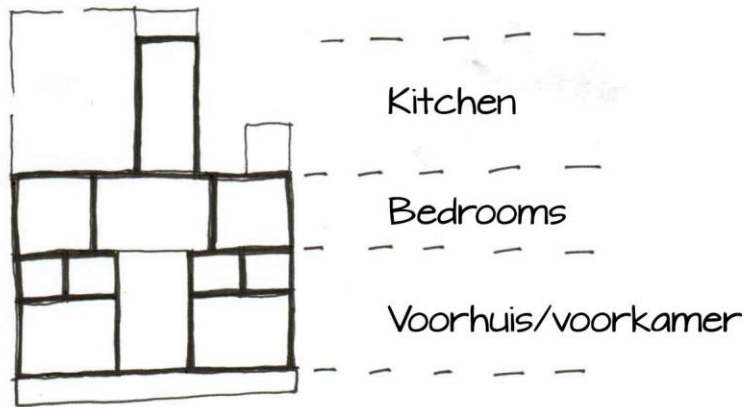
Inverse drawing of traditional Cape Dutch Farmstead
